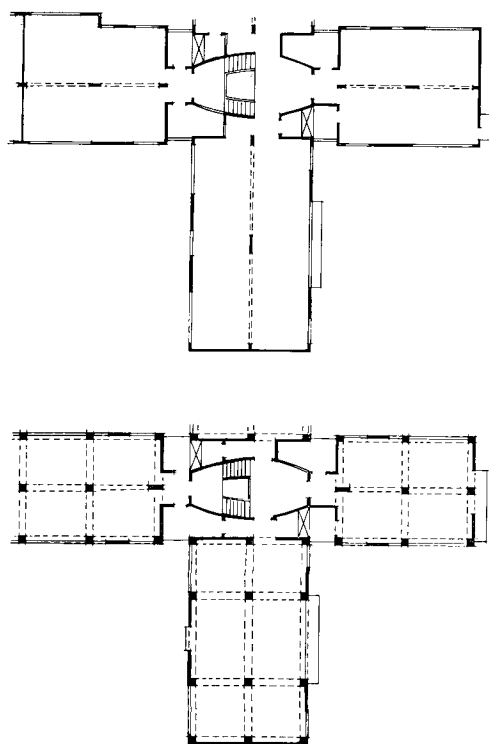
Framing of Highgate Apartments (above). Typical framing (below) of building similar to Highgate Apartments, using wall columns and spandrel beams.
